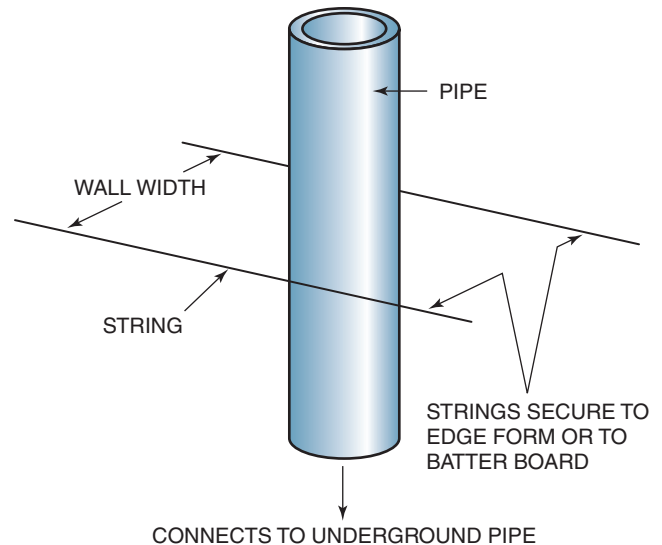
Strings are used to simulate a wall to install underground piping.
